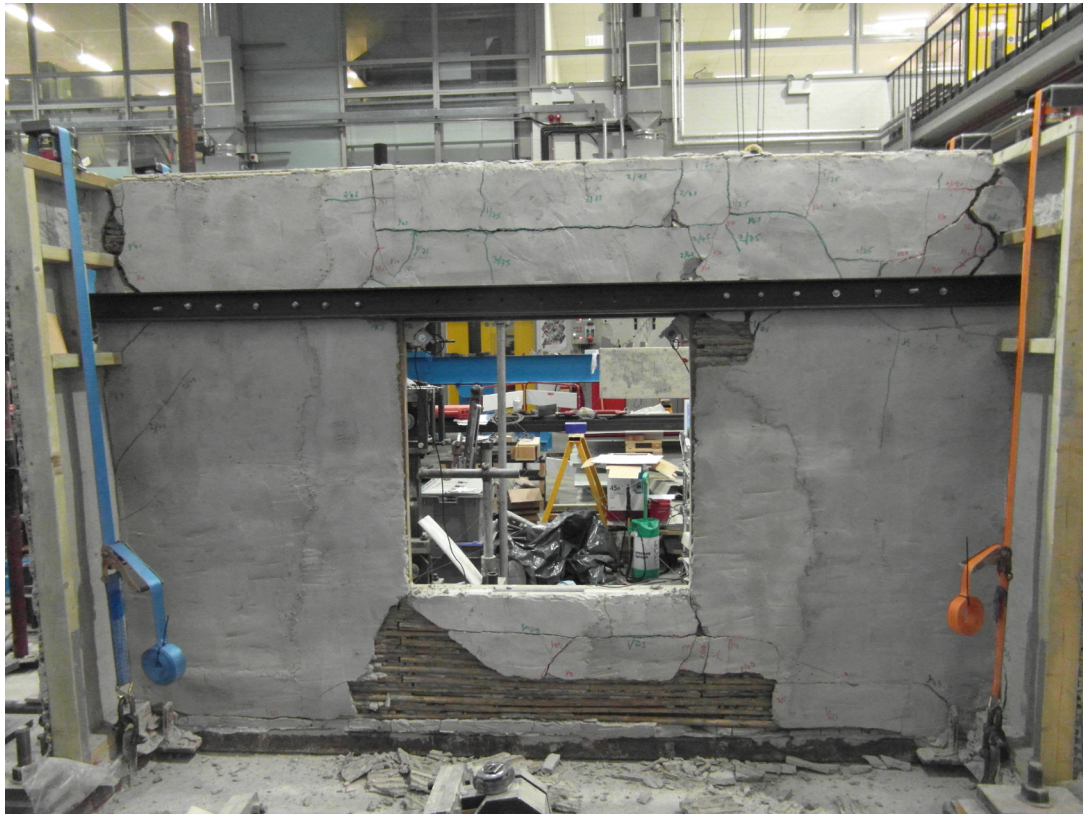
In-plane testing of wall panel at Imperial College London, 2013. Image shows typical damage state at failure, using single-sided chicken mesh only (Kaminski, 2012).
